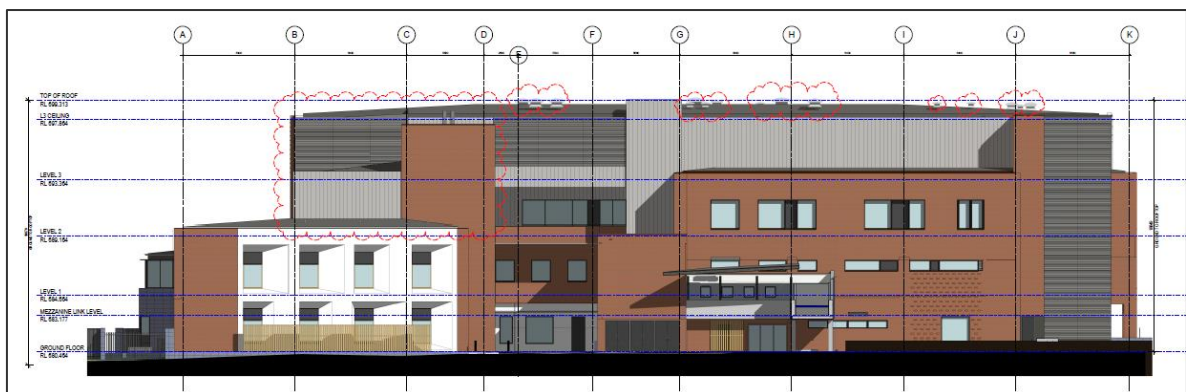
| Proposed South Elevation (SSD 8980 MOD 1)
